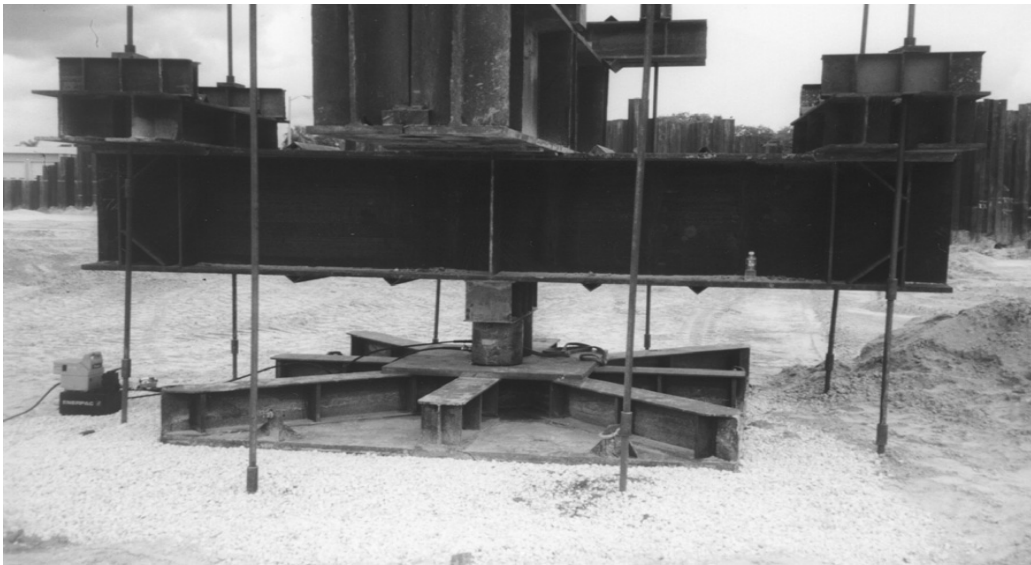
Full-scale load test (10 ft or 3.1 m², loaded to 15 ksf or 719 kPa). (From Hayward Baker Inc. With permission)
